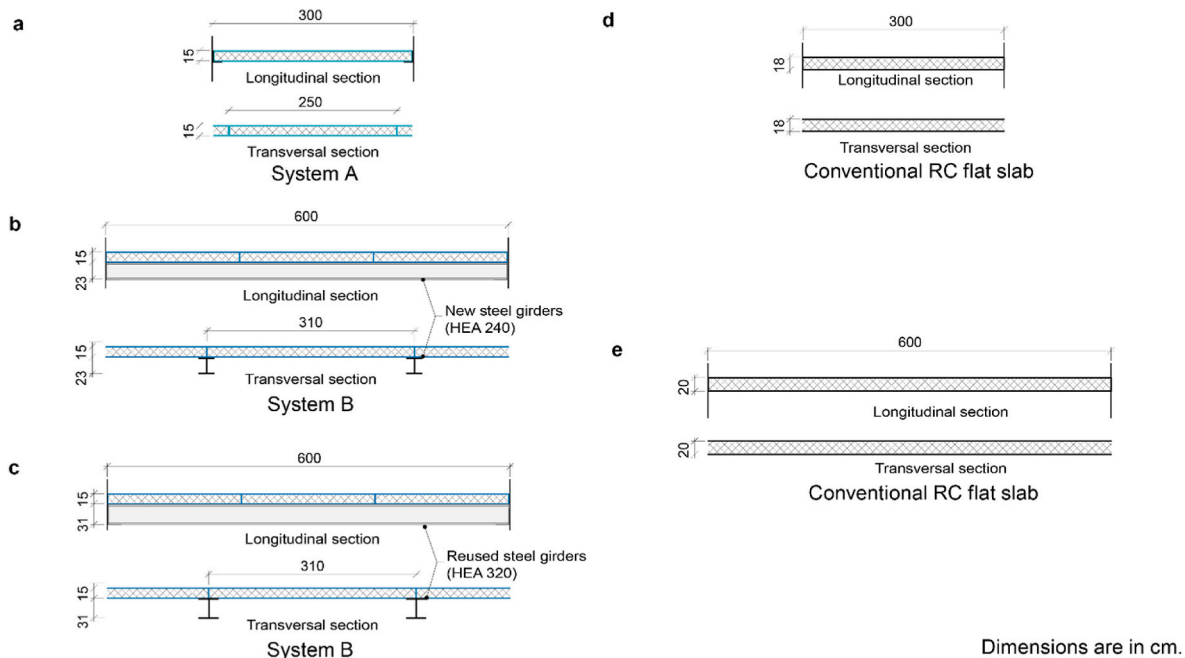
The case-study design solutions for new floors: (a) 3-m reused RC floor; (b–c) 6-m reused RC floor with new and reused steel girders, respectively; (d–e) 3-m and 6-m new RC flat slabs.
